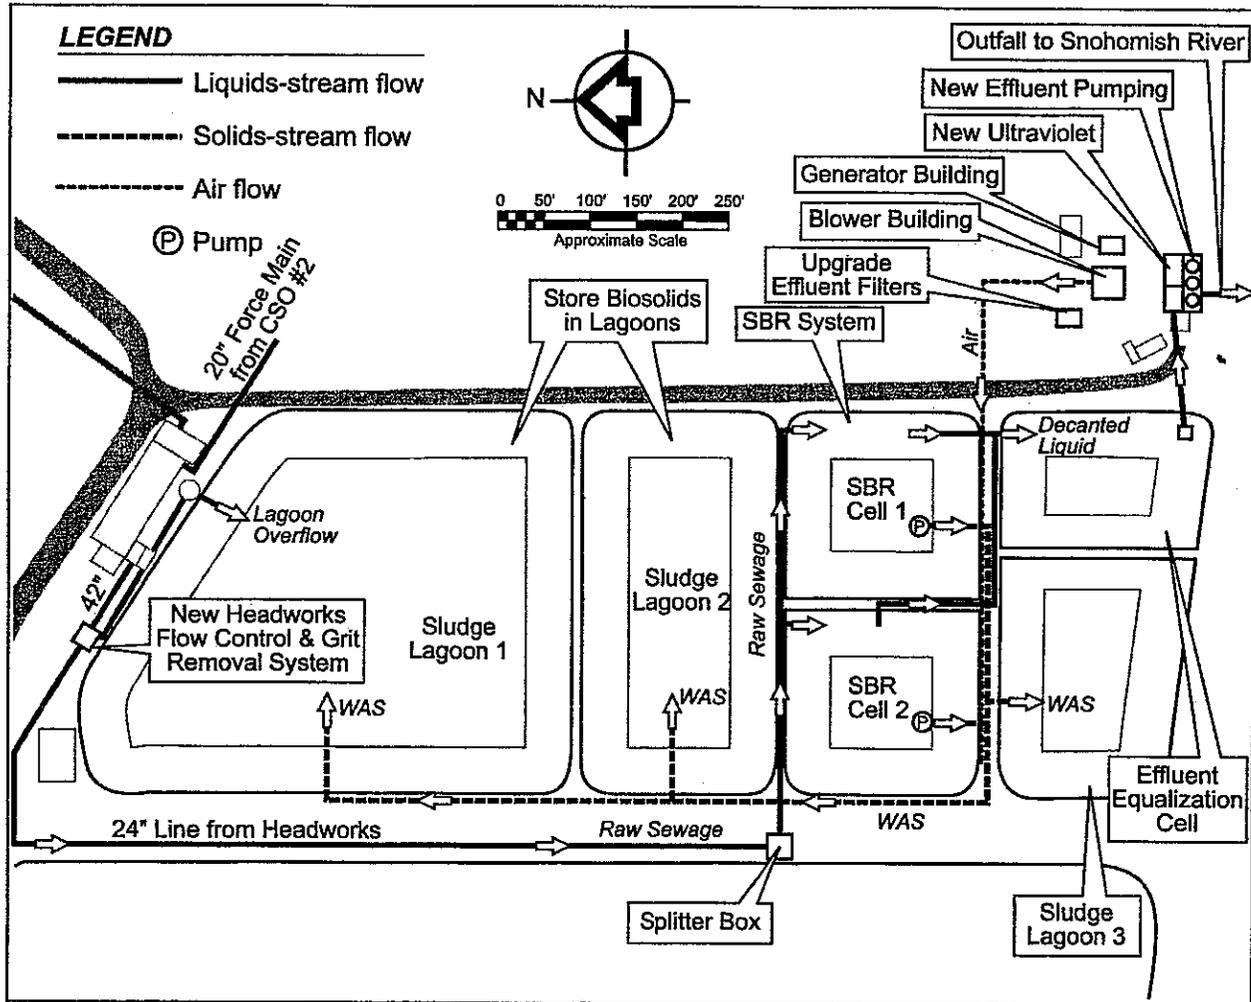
Site Layout for Recommended Treatment Plant Improvements
